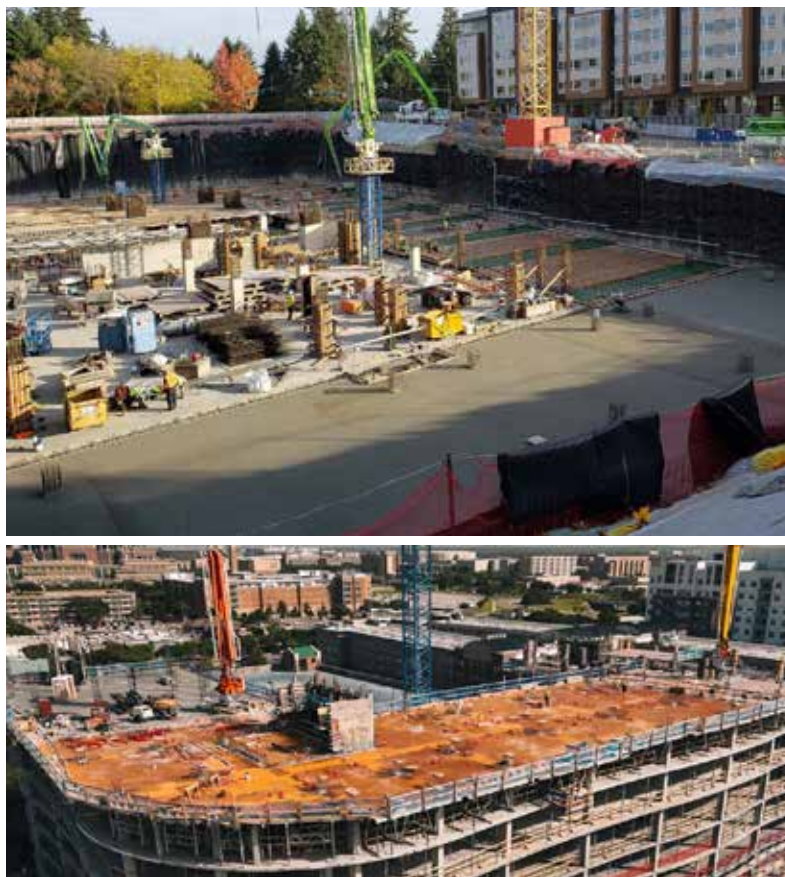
Ideally, sufficient formwork should be available to place concrete in one section, place reinforcing in a second section, and complete curing and formwork removal in a third section. A three-pour concept, as shown in these examples, is desired by contractors to provide labor force and labor task continuity. Both benefits will increase productivity of the crew and individual craft personnel, maximizing their progression on the learning curve (refer to Fig. 2.4.4). (Images courtesy of Conco (top) and Ceco Concrete Construction (bottom).)
